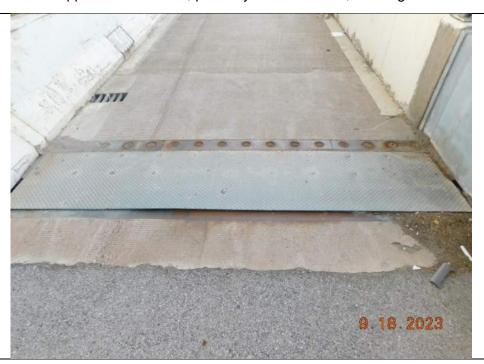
[North Abutment] -Abutment reference line finger joint with cover at east sidewalk / trail, Looking South
